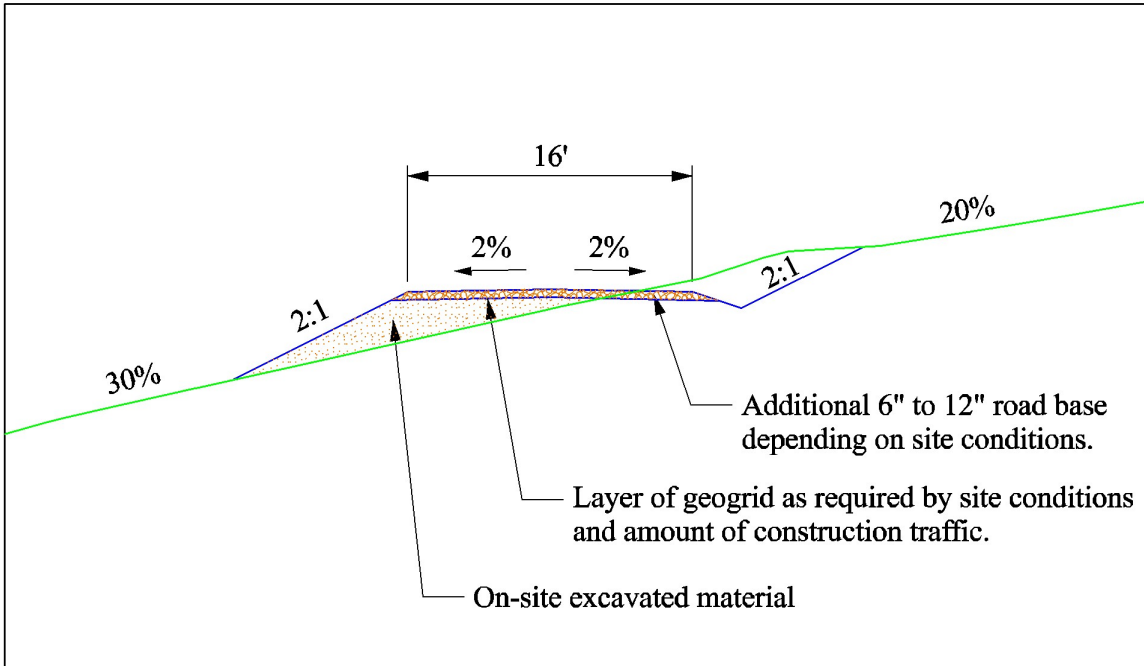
Typical Cross Section for Project Access Roads.
